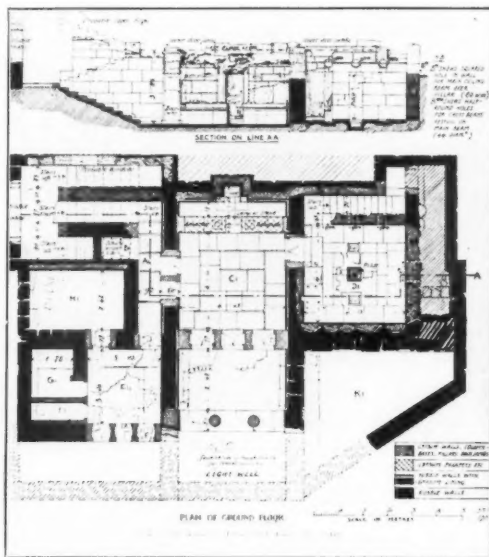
Royal Villa, Knossos: Plan of Ground Floor.
